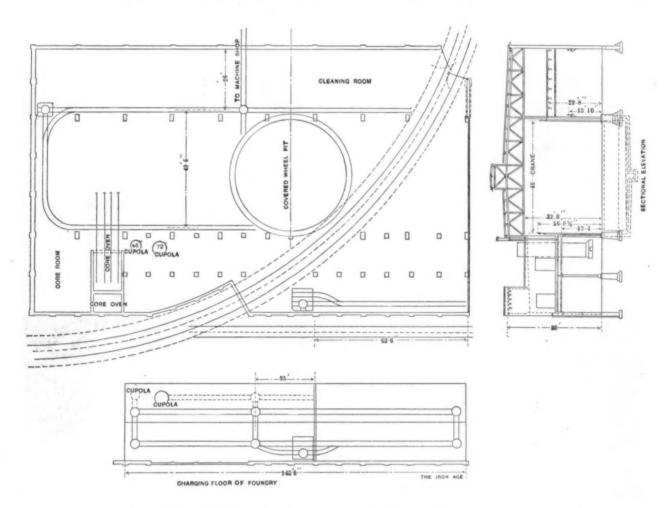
Plan of the Main Floor, End Elevation and Gallery Plan of the New Foundry.
